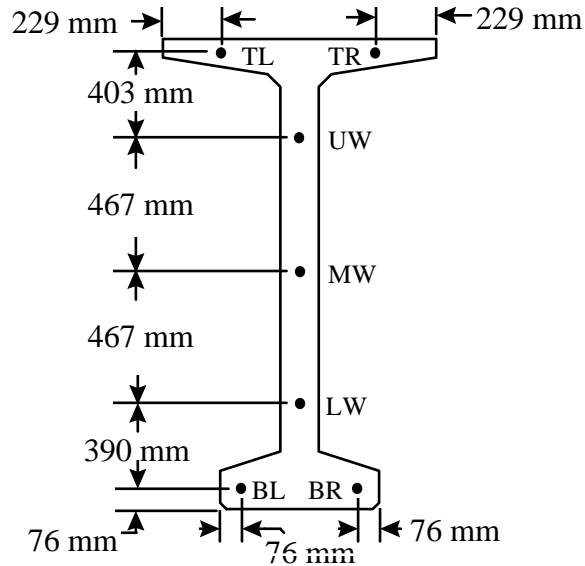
Strand Pattern in W74MG Test Girder
